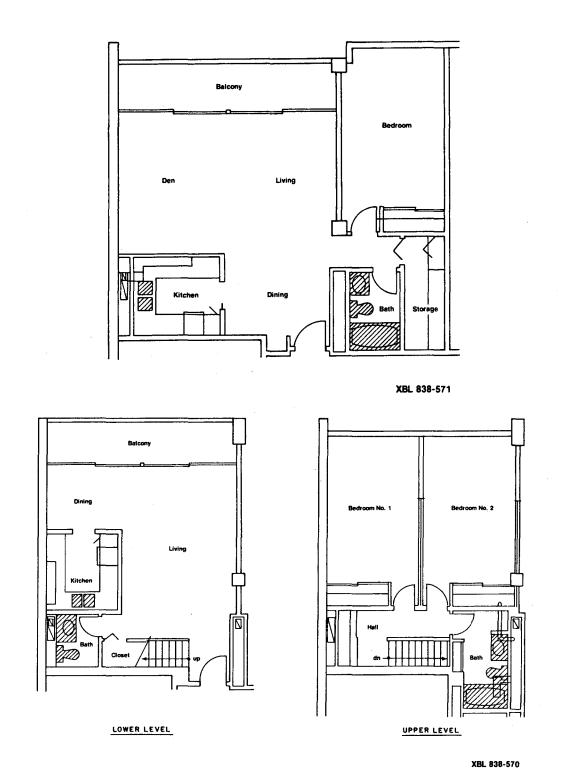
Floor plans for two of City Center Plaza's 13 apartment types. The top plan is a C-type unit; the bottom, an A-type townhouse.
